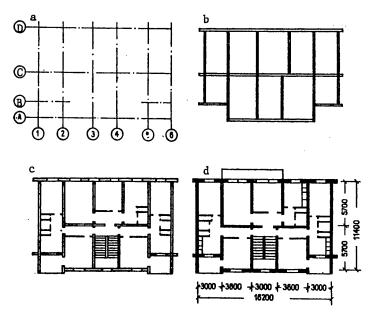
Sequence of graphical representation of the plan view of a residential section: a--plotting the center line grid; b--plotting the wall and partition thicknesses; c--development of the layout of the section; d--final inking of the plan.
